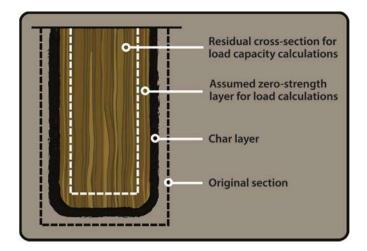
Illustration of zero-strength layer model of fire-damaged wood beam [41].
